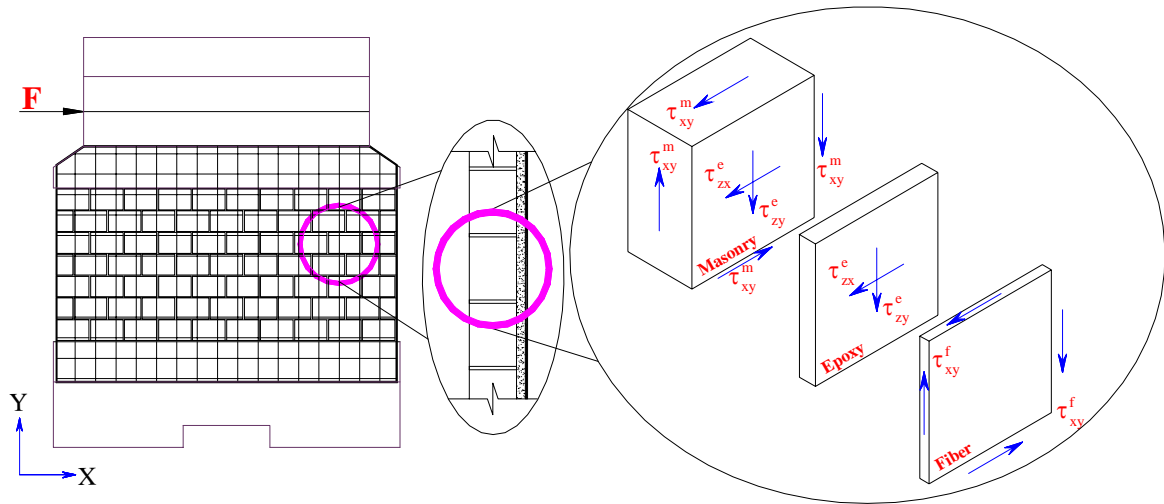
URM wall retrofitted using FRP (full surface, single side) and differential element of the same retrofitted wall showing masonry, epoxy, and fiber stresses
